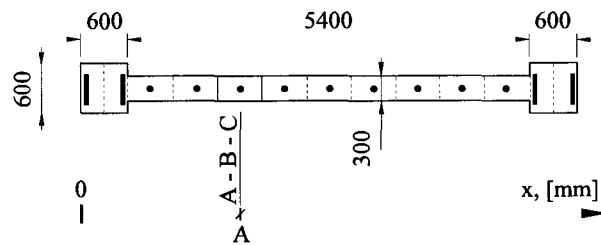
Modeling of shear wall sections for B18 located in Montréal
